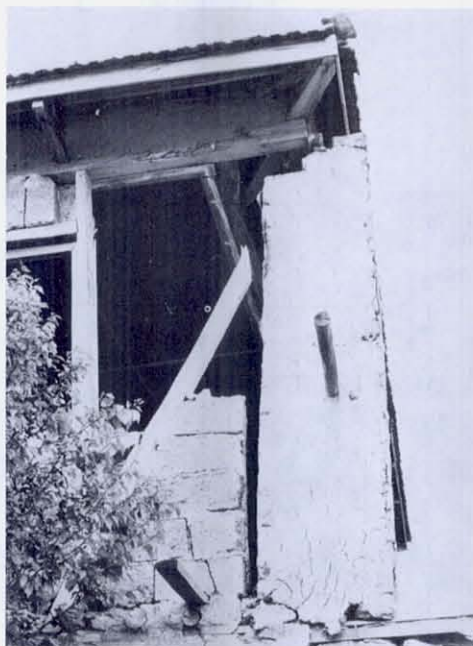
A common mode of failure of adobe houses in the Burdur region was the separation of exterior wall corner joints, permitting walls to tip outward. Often a wall was braced perpendicular to its plane by embedding a piece of wood at eye level in the adobe, then installing a diagonal brace from this to the floor. Usually only one or two nails were used, loaded in tension when the joint tried to open. It was always observed that the nails pulled out or broke through the diagonal; in no case was the embedded wood pulled loose.
